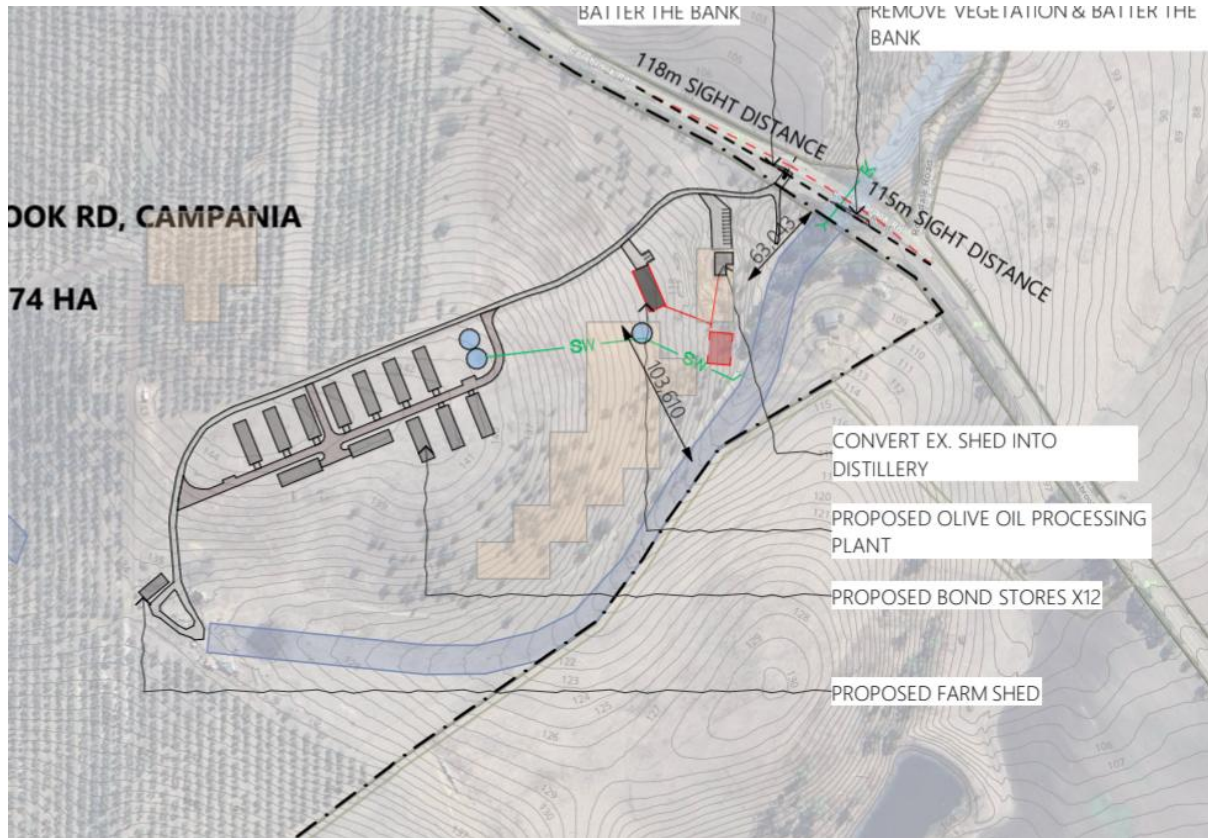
Site Plan showing that no works or development are proposed within the Waterway and Coastal Protection Area.
